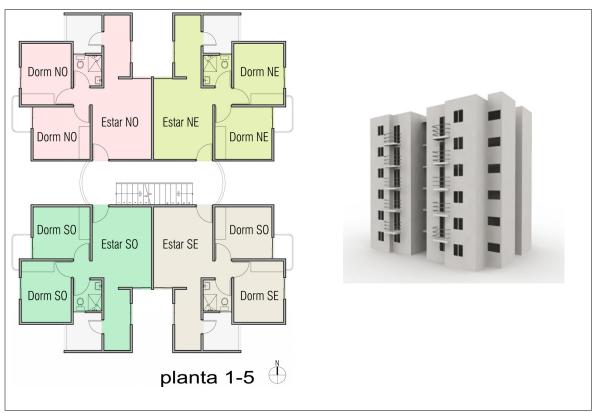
Vertical building type floor plan and 3D model, no scale Source: [Campos 2011]
